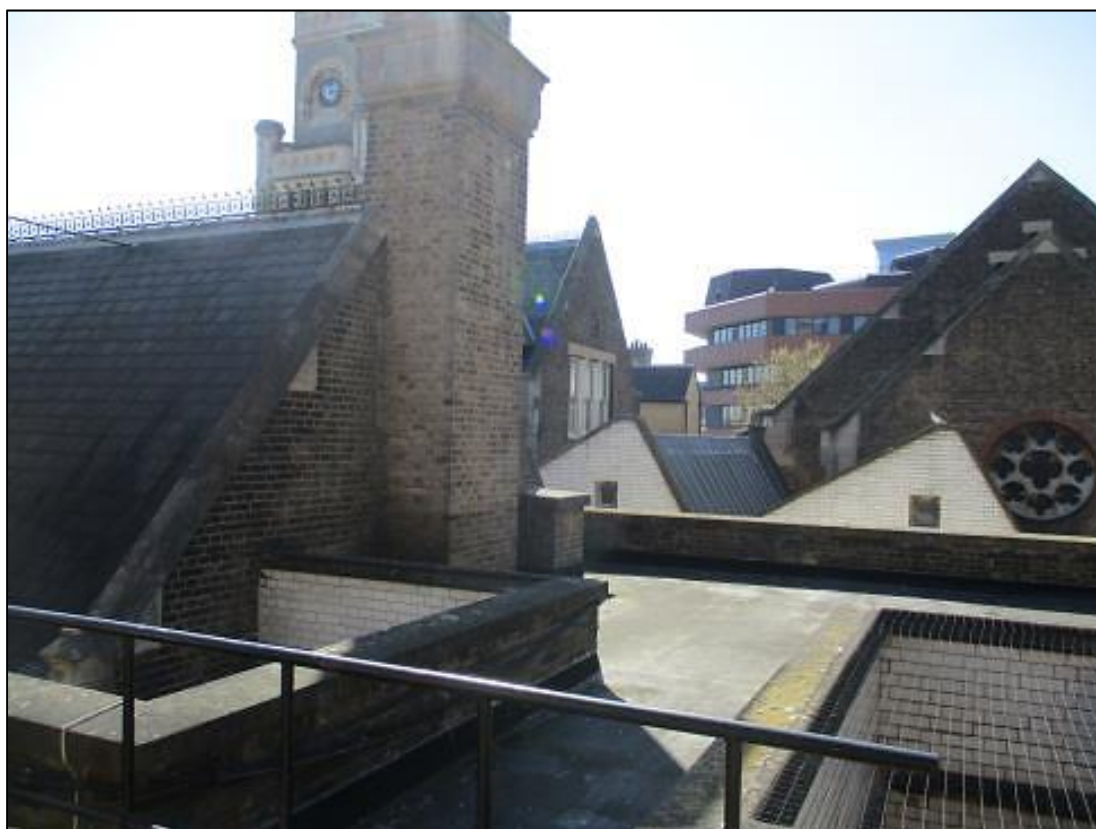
View from roof terrace towards tower (left) and the Victoria Hall and rose window (right). Note the ad-hoc infilling and roofing (strong sunlight).
